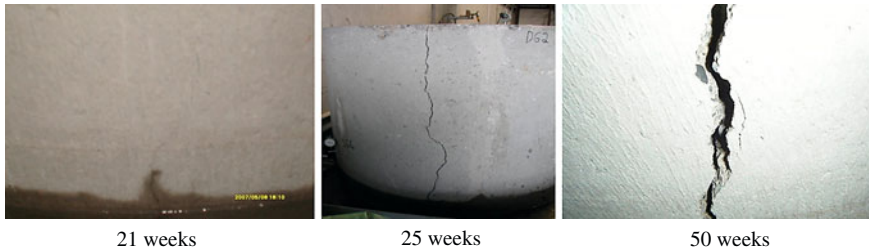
Progression of vertical crack in concrete manhole ring in 21, 25 and 50 weeks. At 33 weeks it was 12 mm wide
